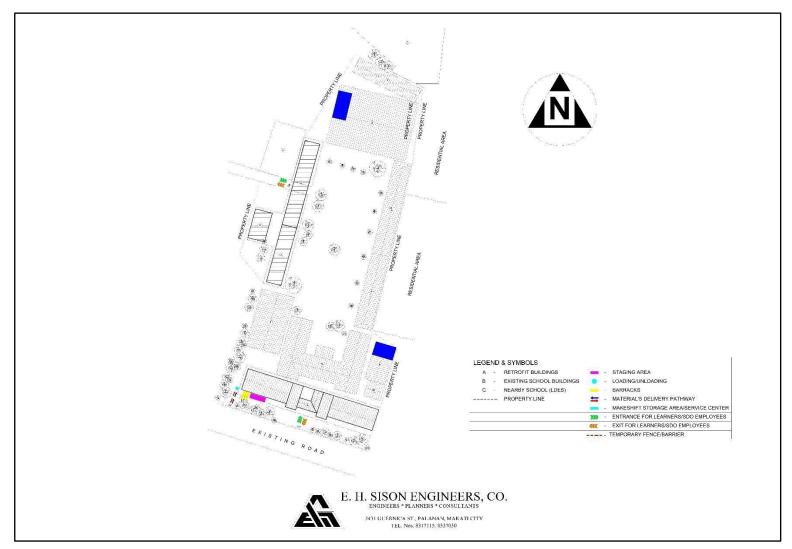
Traffic Plan inside the Premises for Caruncho Building
